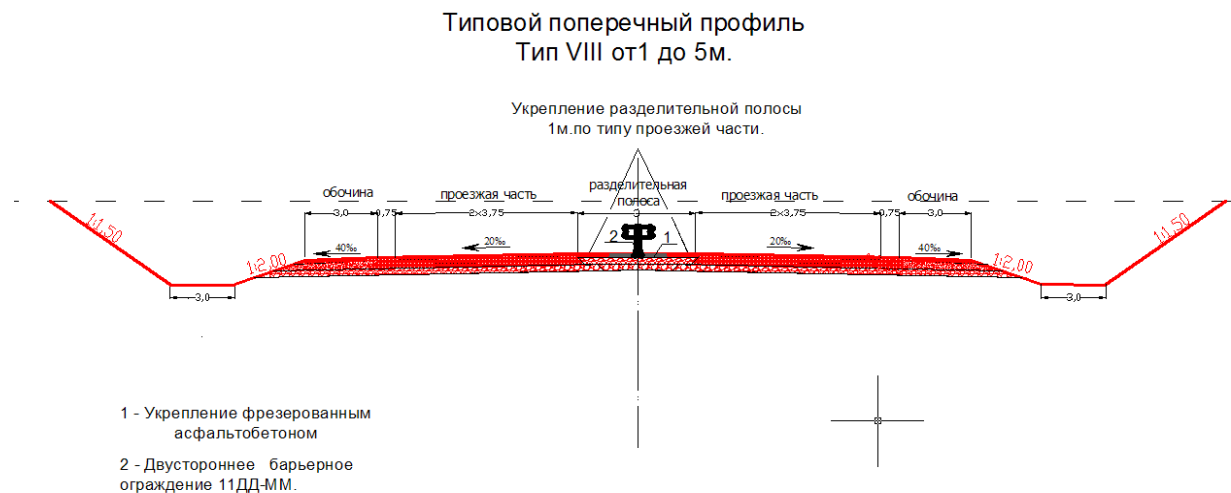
Typical transversal section of section 2 of the offered reconstruction and construction of additional two lanes of the existing road
